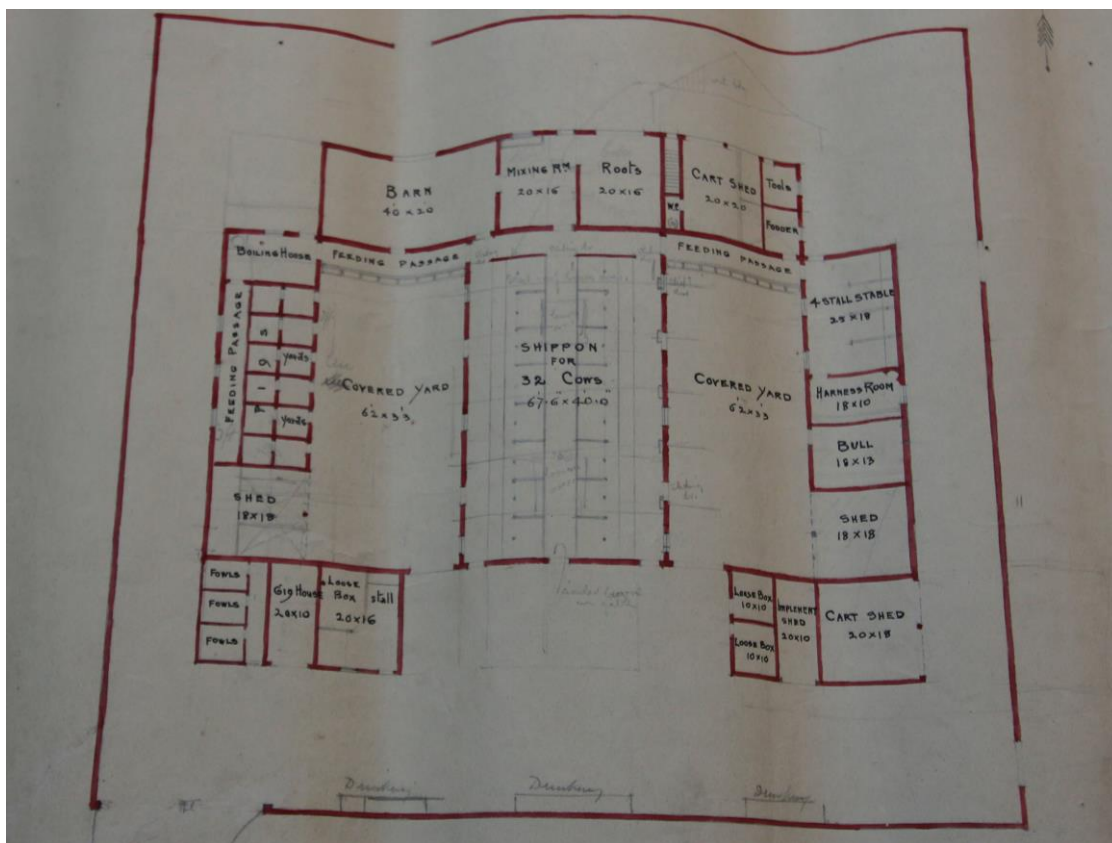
Pre-1915 plan of proposed buildings at Brockhall Farm, held by Mr. Willan, which broadly reflects the plan form of the original range
